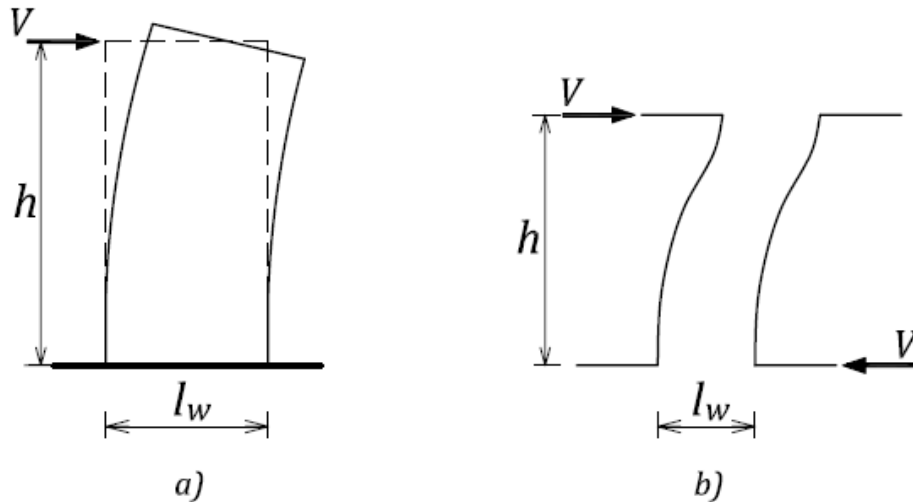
Wall stiffness models: a) cantilever model, and b) fixed-end model.
